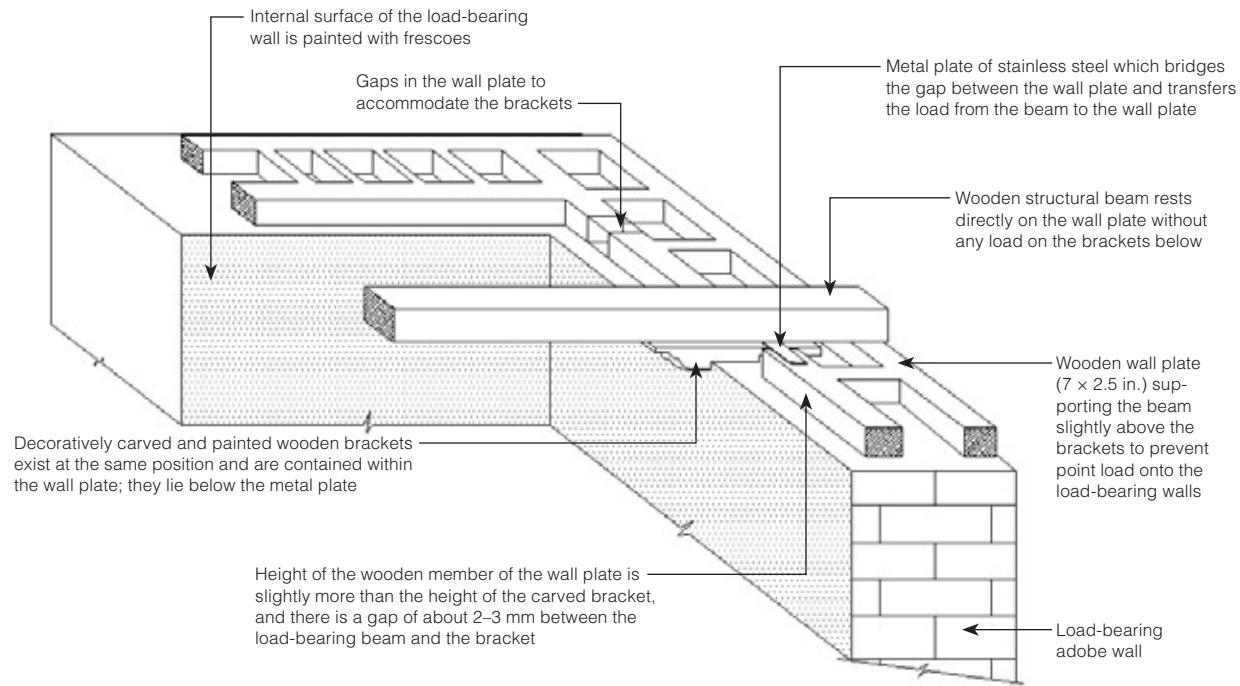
Wall plate detail for the historic earthen structures in the Spiti and Kinnaur Valley of the western Himalayan region, giving detail and sizes of the wooden wall plates running all along the length of the load-bearing adobe walls, to evenly distribute the roof load carried by the rafters and beams. Originally drawn by C. Chaudhry; taken from the phase 3 report of the Nako Preservation Project (Khosla 2004), with some modifications.
